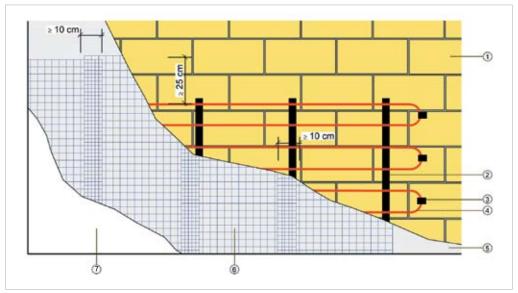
Schematic representation of the structure of wall heating/cooling with wet construction
